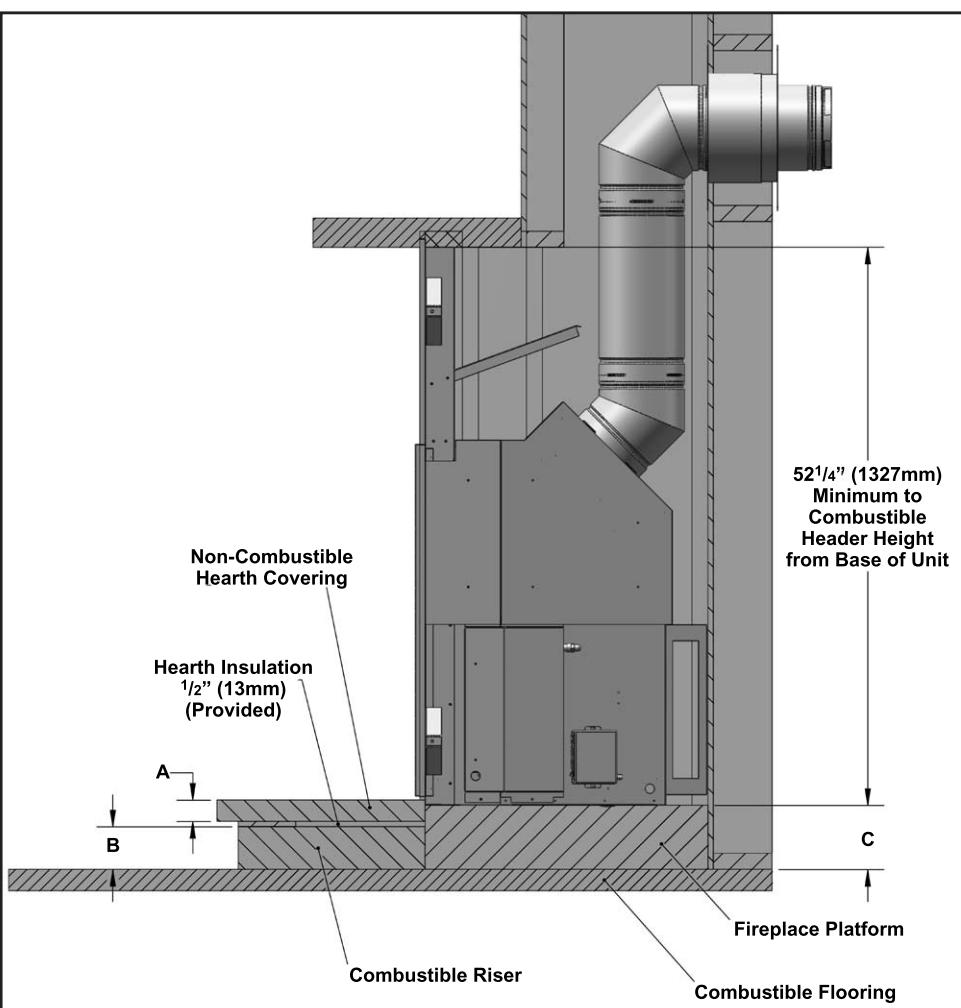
Typical Framing for a Raised Hearth - Detailed.
